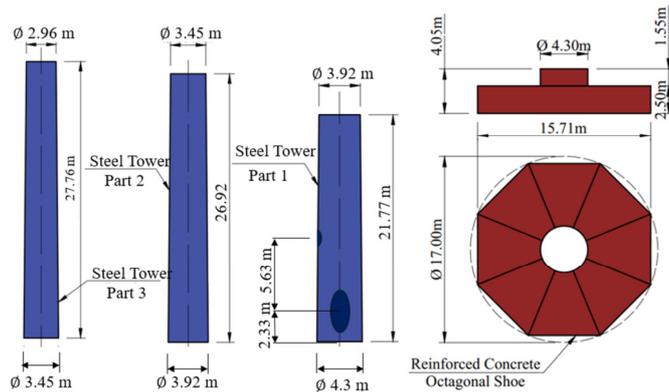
Investigated steel wind tower and reinforced concrete foundation.
